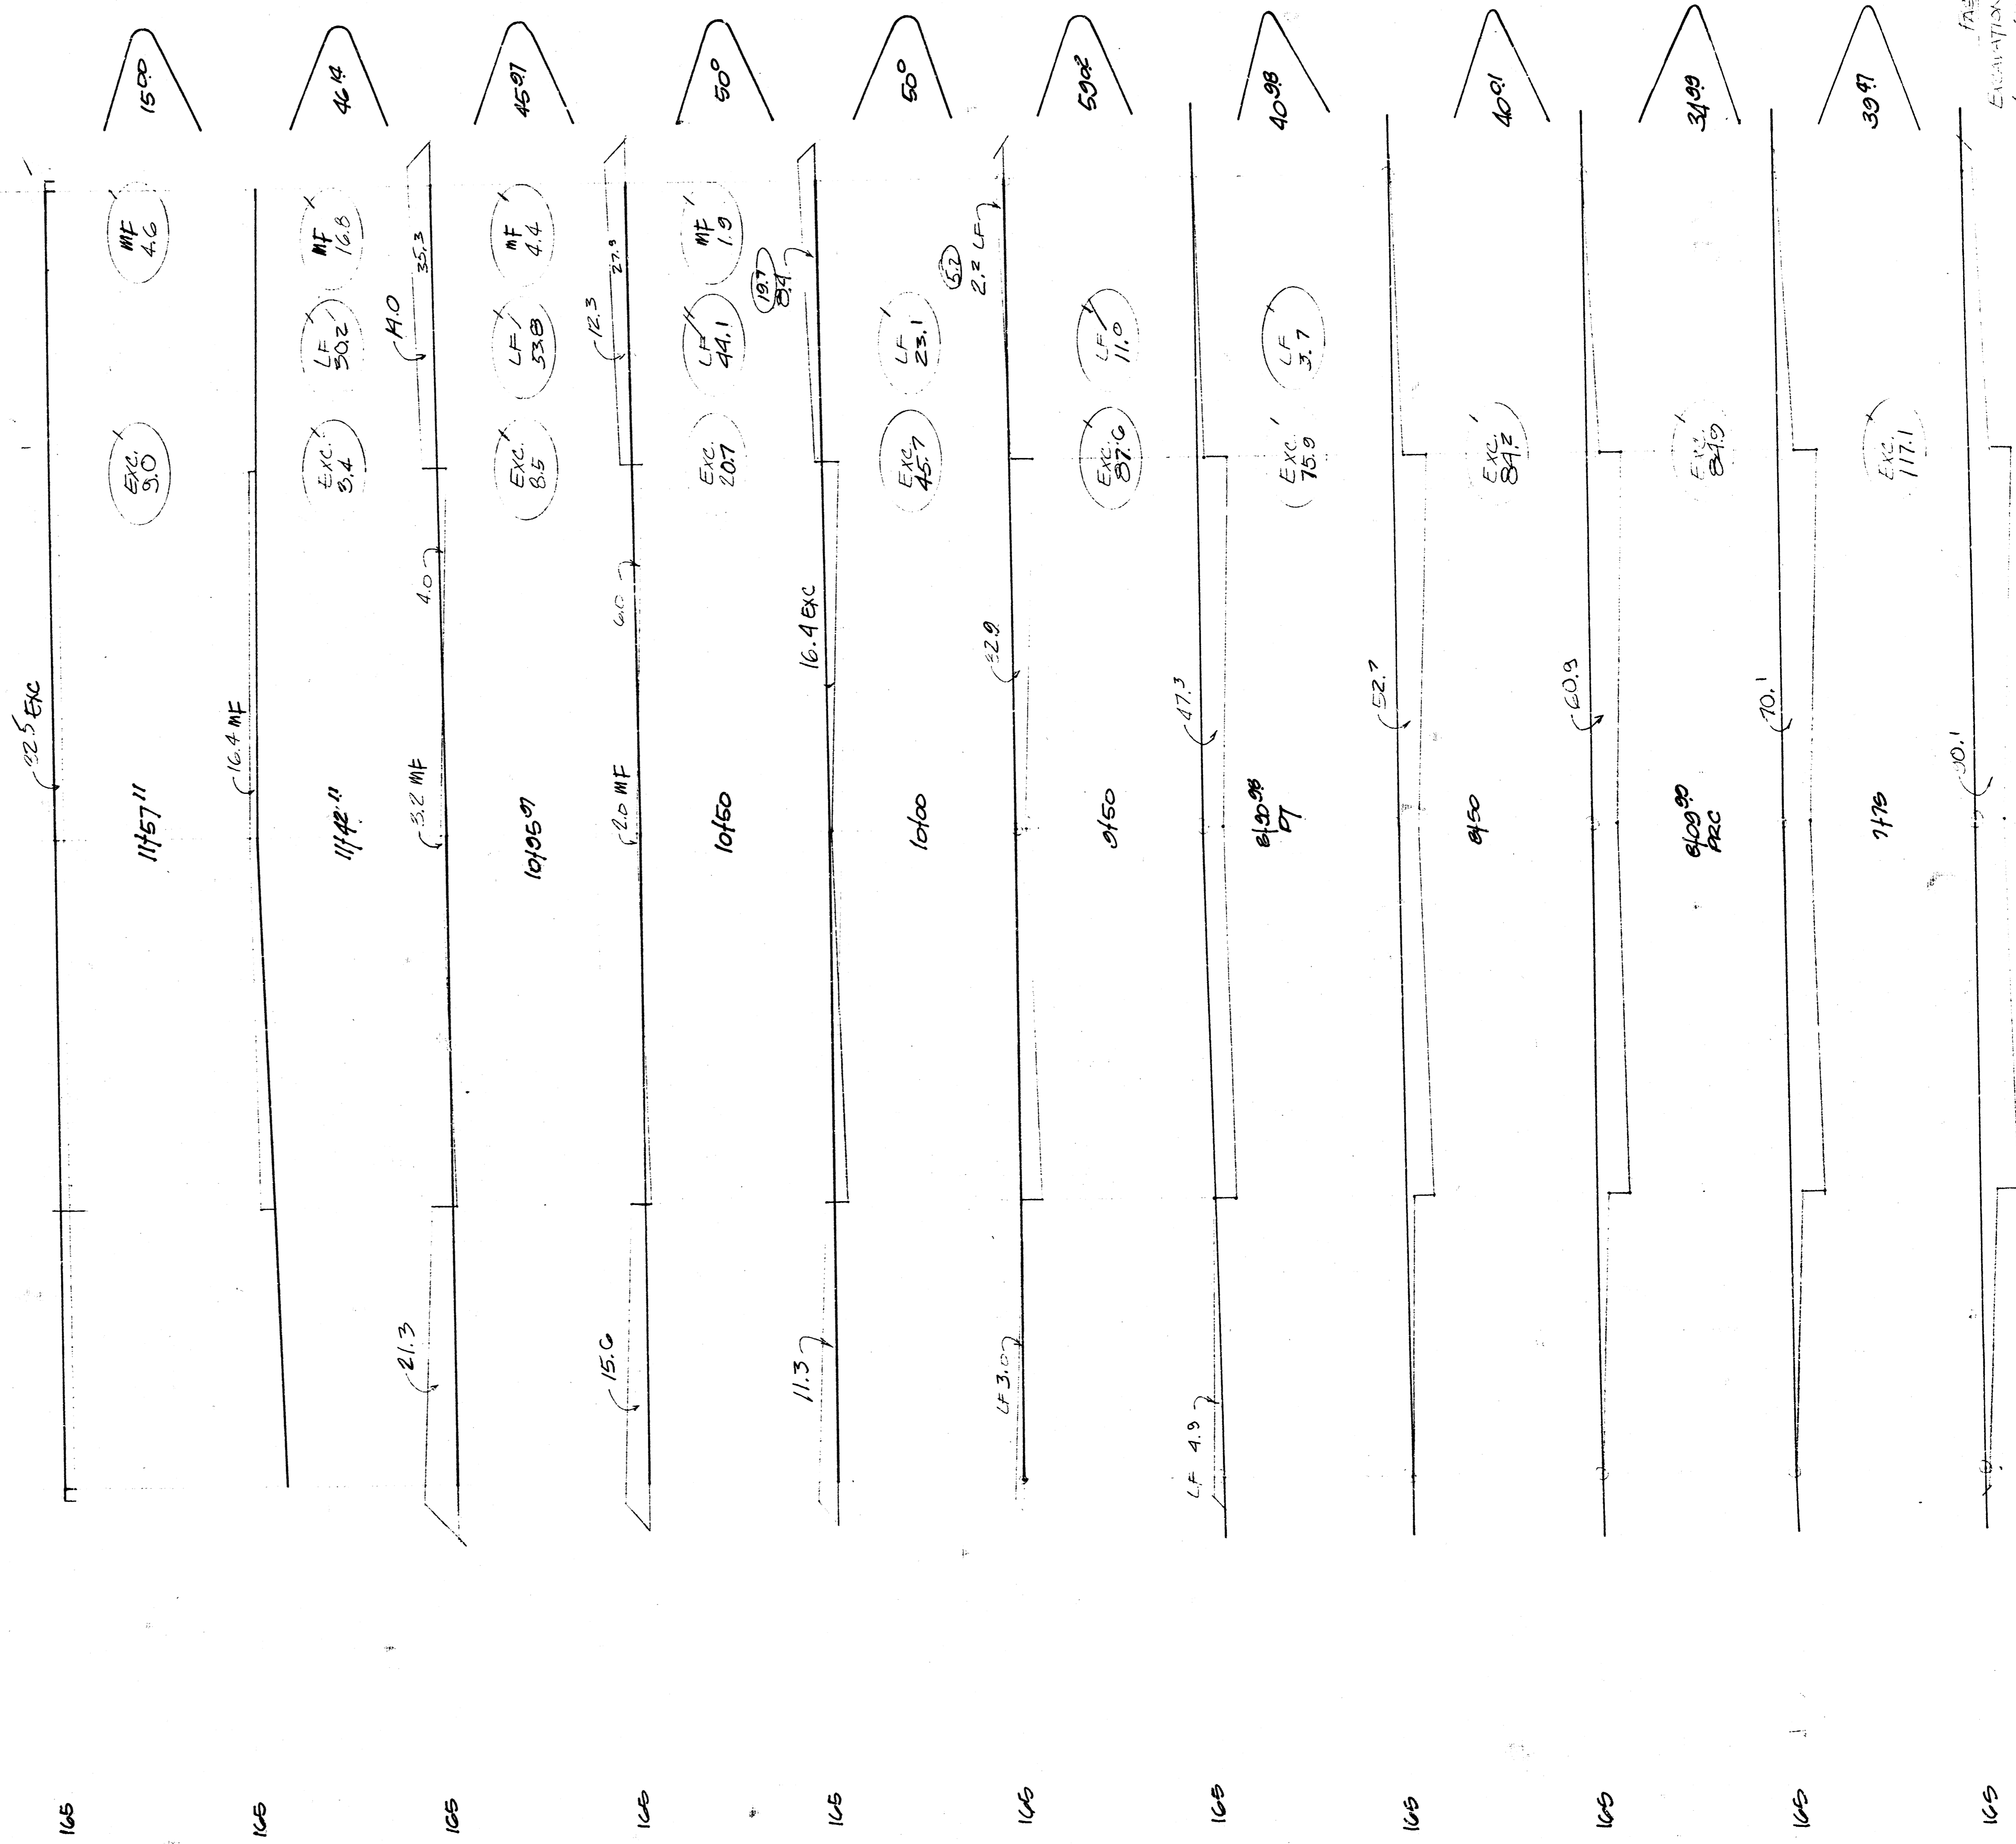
SINGLE PLAN AND PROFILE FULL LINE
